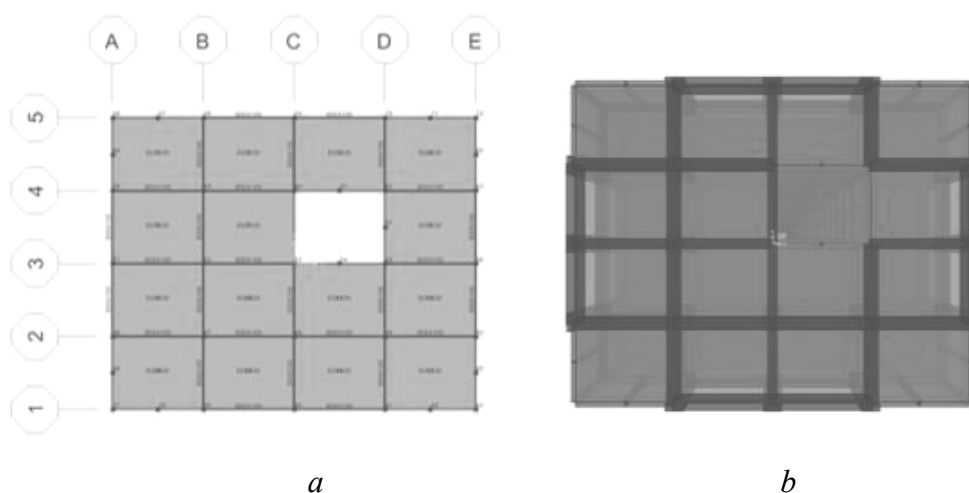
a* – Plan of selected concrete structure; *b* – Location of concrete curtains in finite element model
